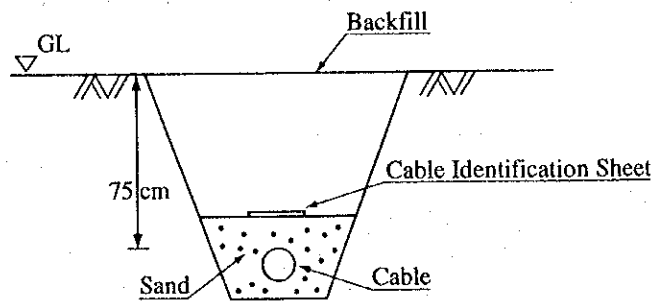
Typical Arrangement of Distribution Cable Installation
